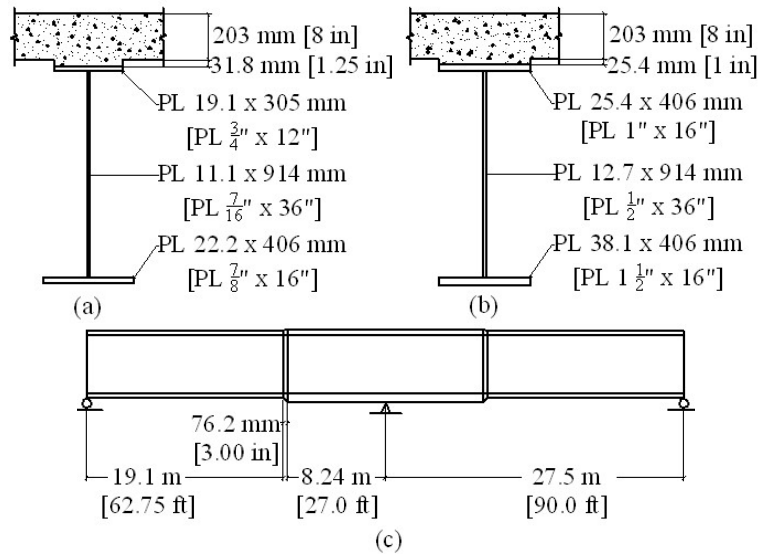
(a) Positive girder cross-section; (b) Negative girder cross-section; (c) Location of positive and negative cross-sections.
